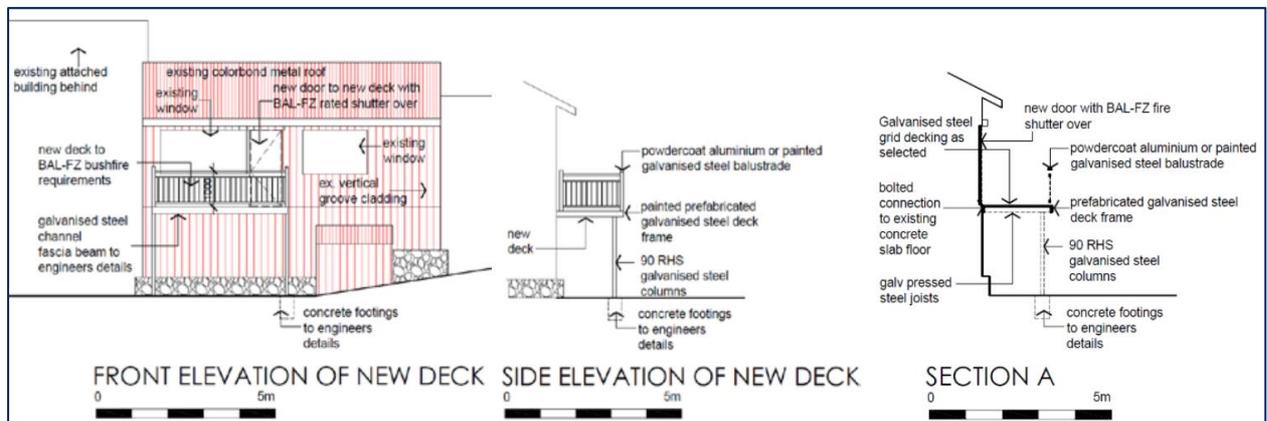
| Elevations of proposed Aspen Creek 2 deck (Source: Applicant's documentation)
